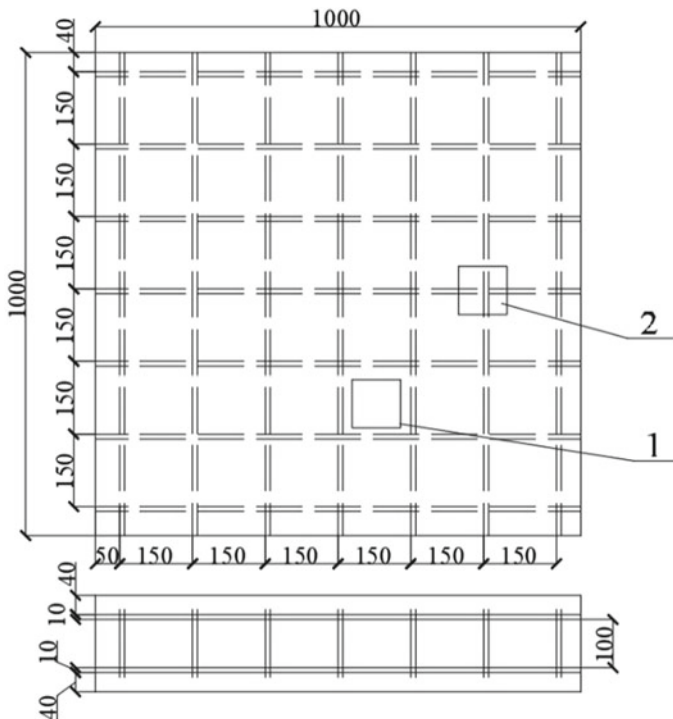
Cross section and general view of fragments of floor slabs: 1—section of concrete in the structure; 2—section of reinforcement of the structure
